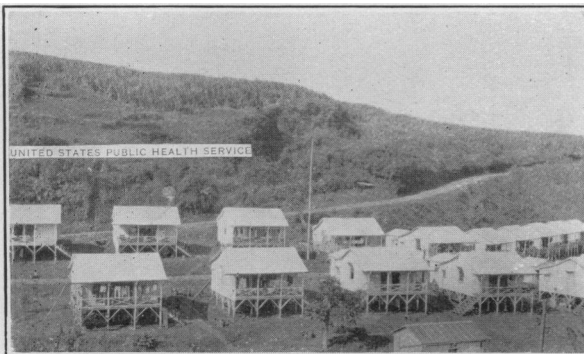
BUILDINGS OF CAMP ELEVATED AS RAT-PROOFING MEASURE.
